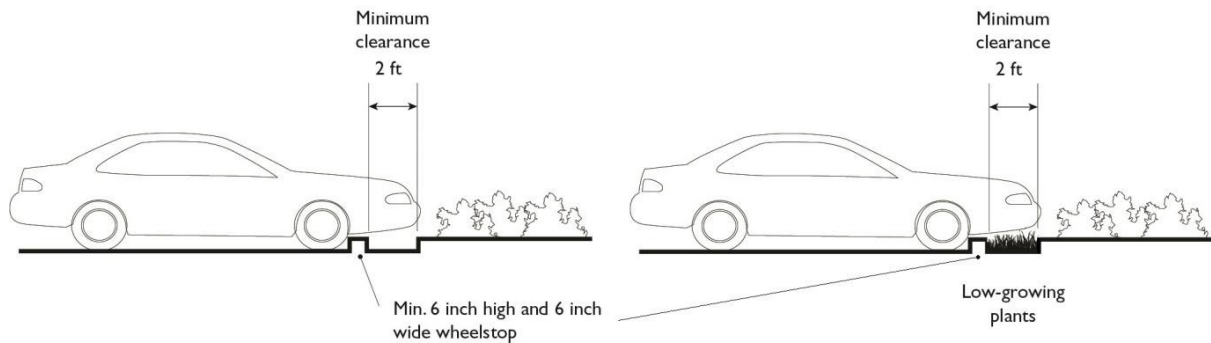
(B)(13)(E): PARKING LOT LANDSCAPING
